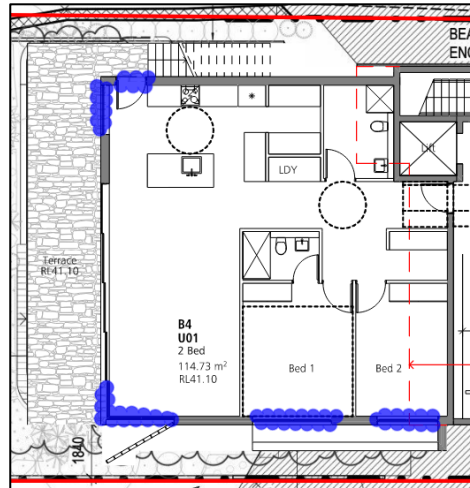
Openings requiring protection in B4 at Lower Ground Floor level
